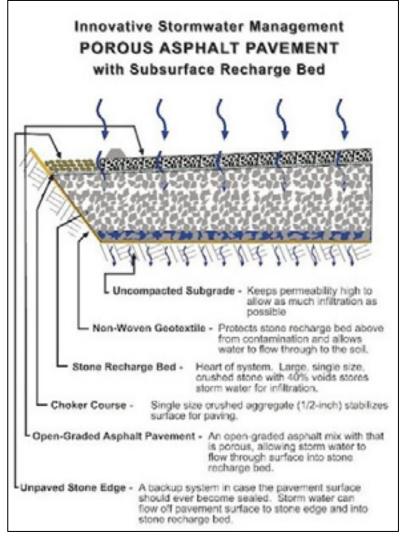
Porous Asphalt Cross-Section Source: National Asphalt Pavement Association
